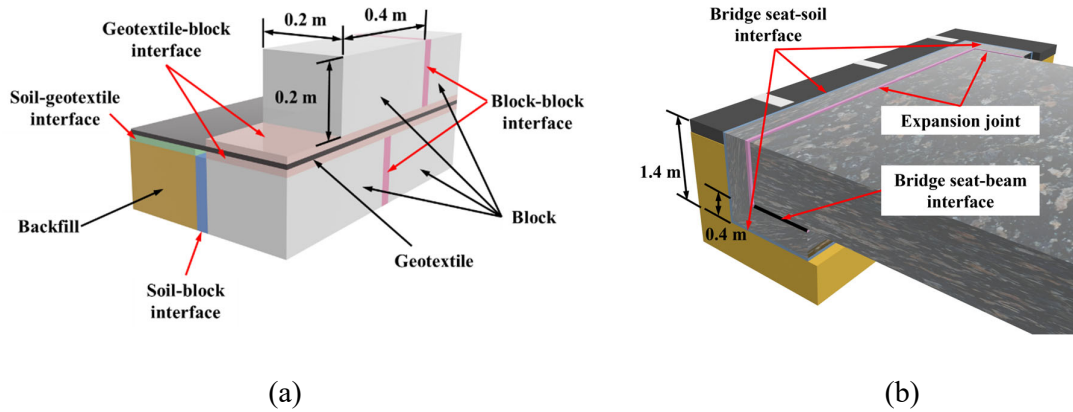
Interface details: (a) GRS wall and facing; (b) bridge seat and bridge beam
